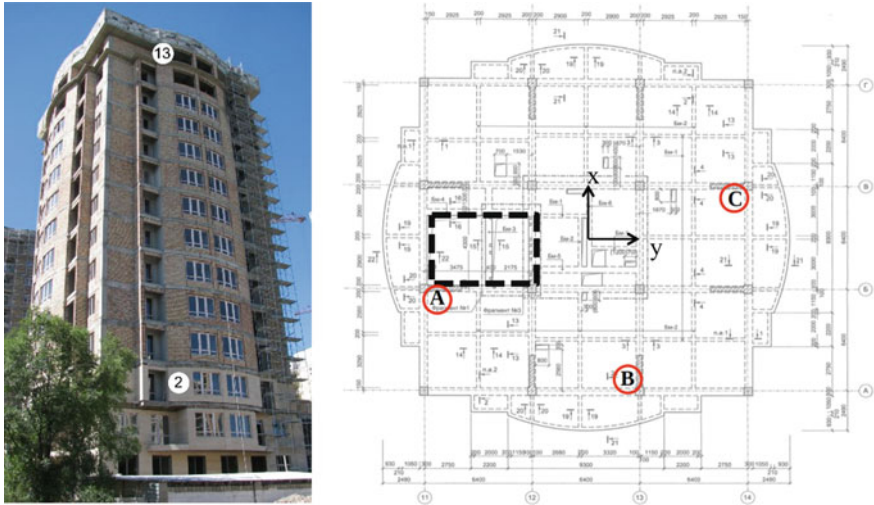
Left: 14-story RC building in Bishkek, Kyrgyzstan. Right: Floor layout (image from project: Earthquake Model Central Asia)
